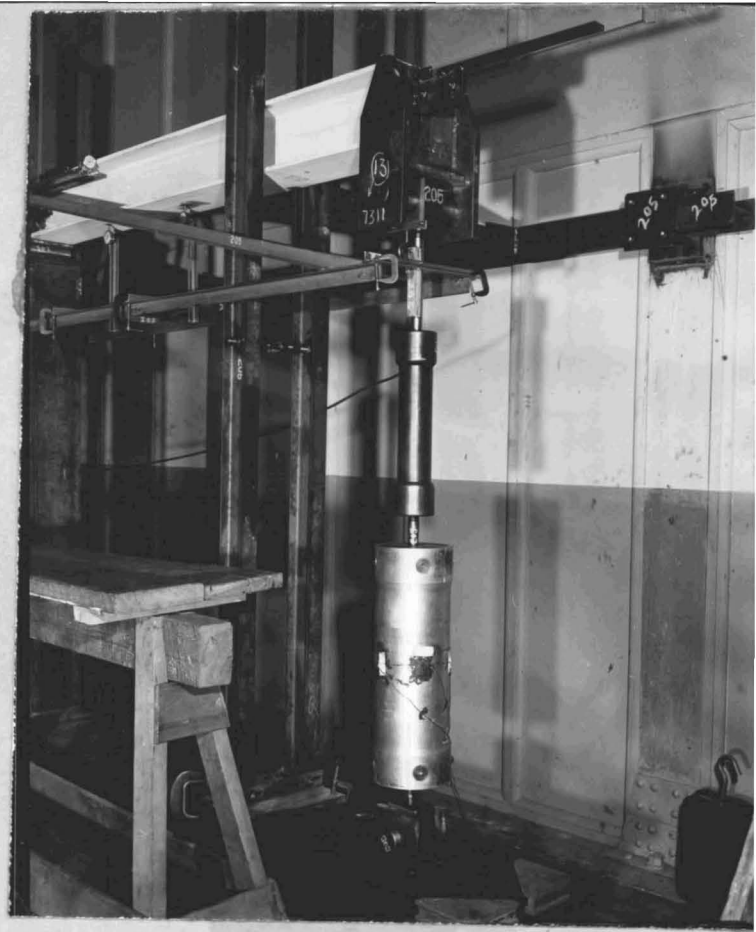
, The dynamometer and hydraulic jack assembly for loading the continuous beam.
